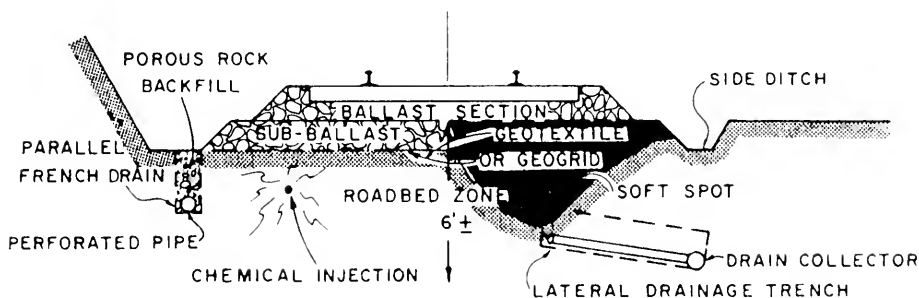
TYPICAL SECTION INDICATING VARIOUS ROADBED TERMINOLOGY
